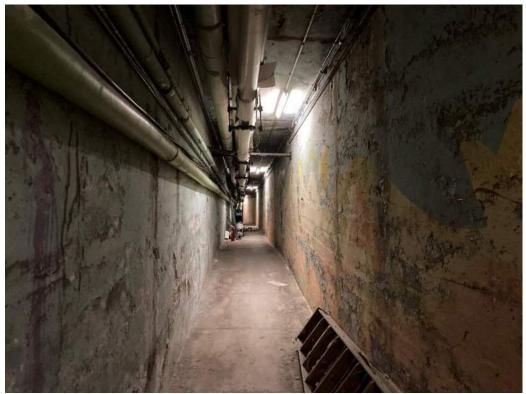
Steam Tunnel Connecting Sullivan and Horace Mann
